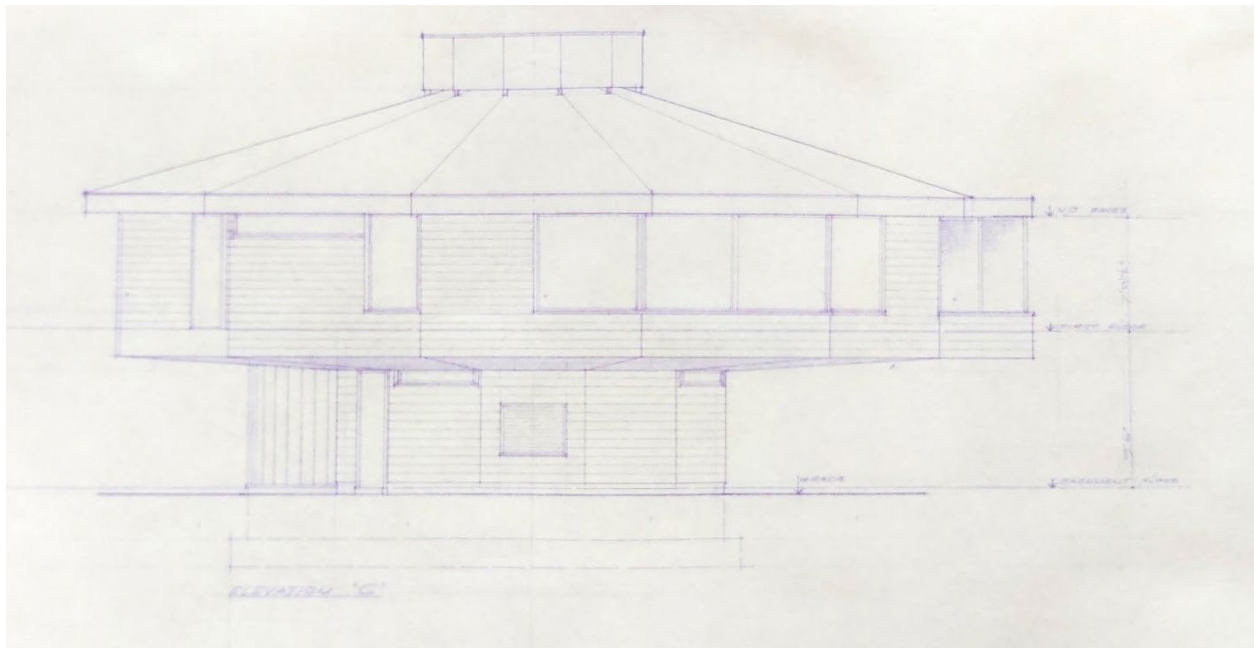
Architectural drawing showing exterior details, original drawings are in the care of Harry Lennard.
